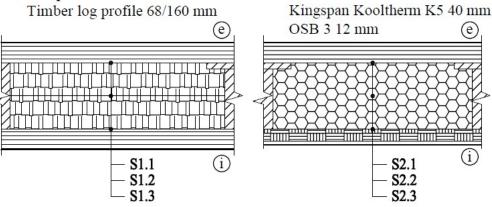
Left South wall 1 (S1), right South wall 2 (S2) – layers, probes placement.
